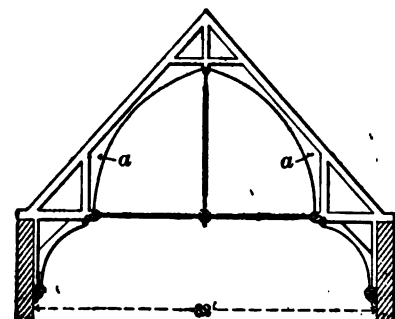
Hammer-beam Truss for Grace Chapel, New York City
